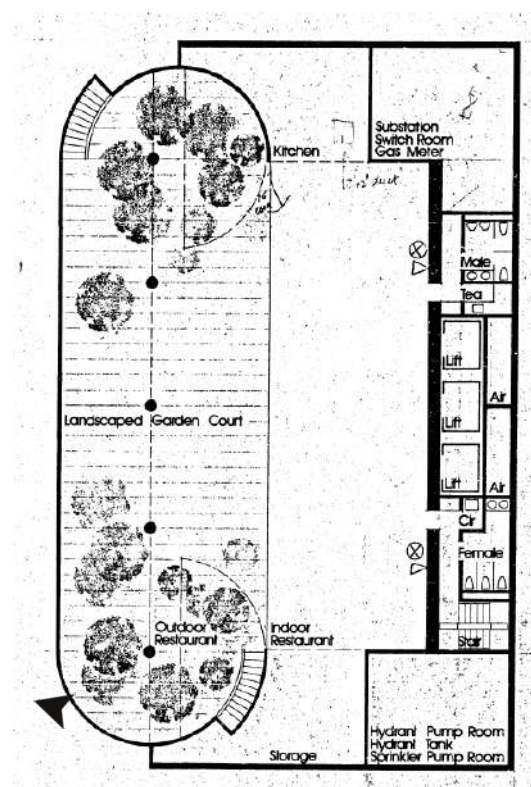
Basement floor plan, stamp dated 1974 (BAP).
